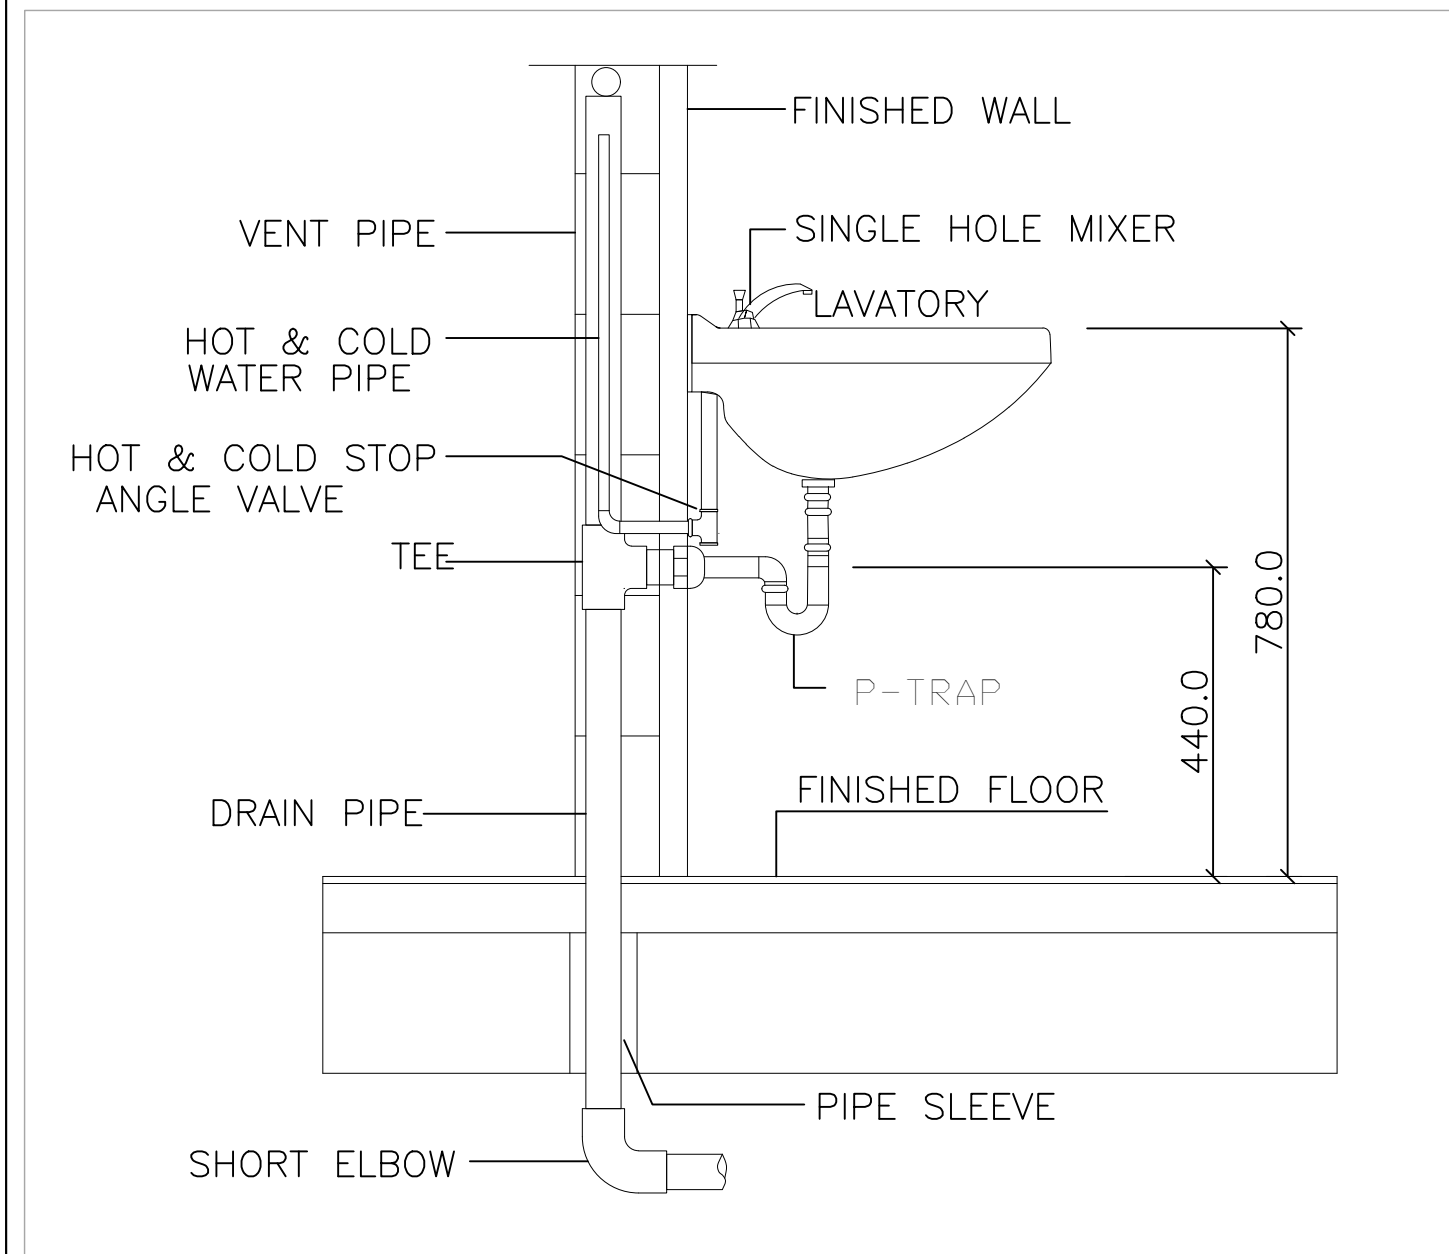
TYPICAL PIPING INSTALLATION FOR LAVATORIES IN DETENTION AREA
